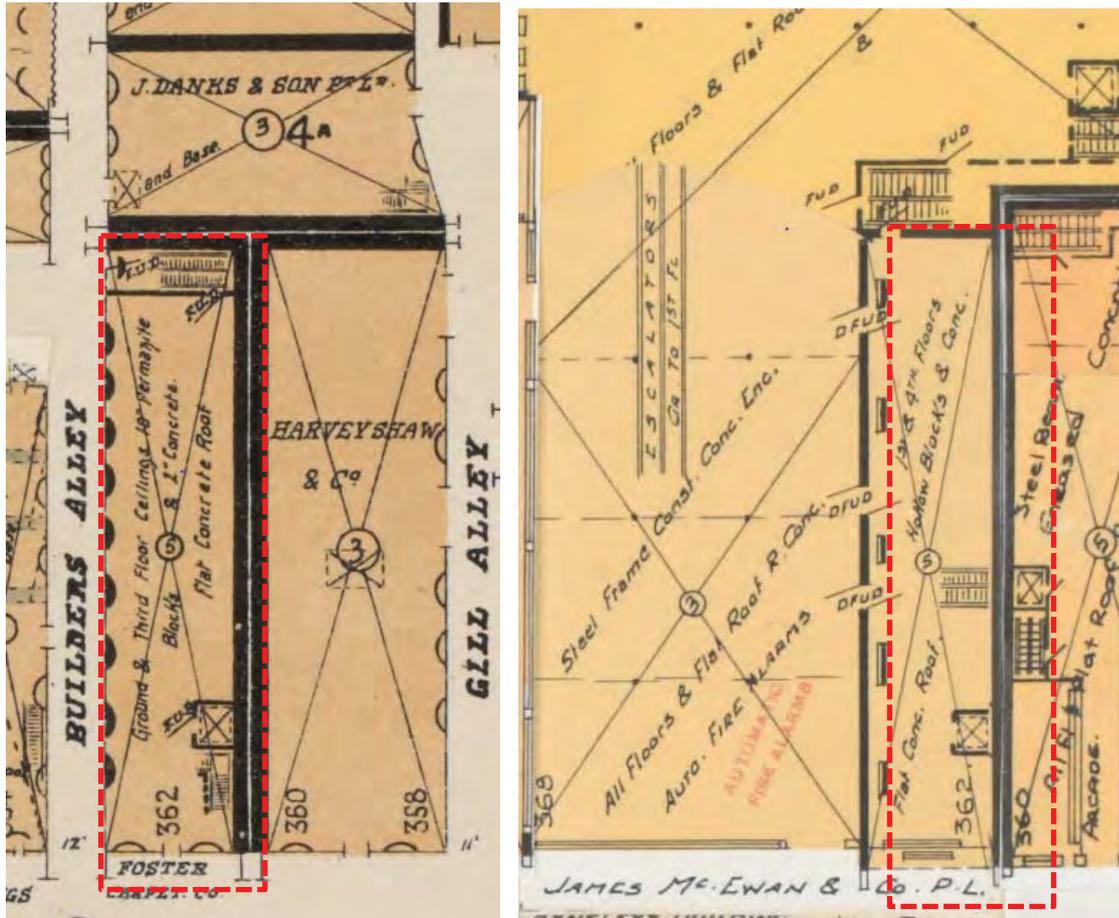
Detail of Mahlstedt fire insurance plan, Map 14, 1925 showing the newly altered warehouse (left); and Mahlstedt fire insurance plan, Map 14, 1948 showing the warehouse forming part of James McEwan and Co's stores (right)
